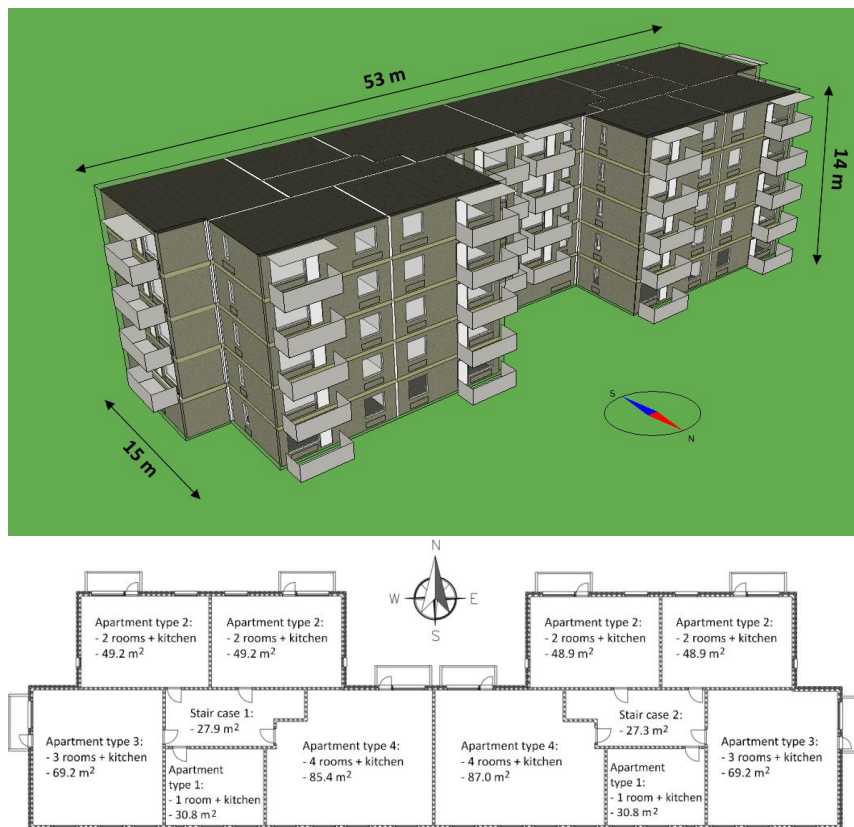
The main geometry of the studied concrete large panel apartment building (above) and the floor layout of the apartment floors (below).
